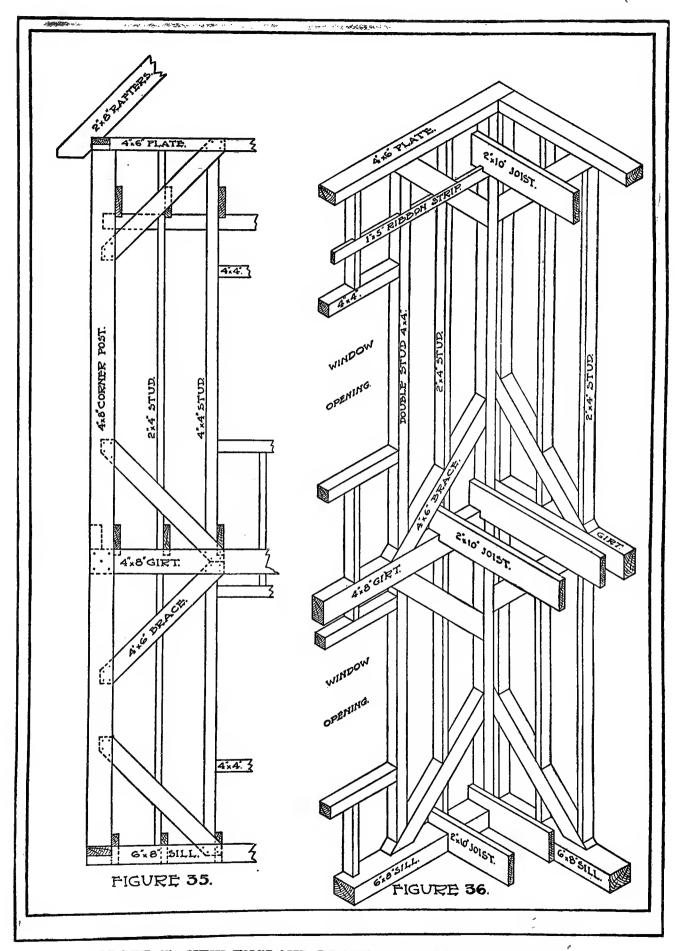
NEW ENGLAND BRACED FRAME CONSTRUCTION
